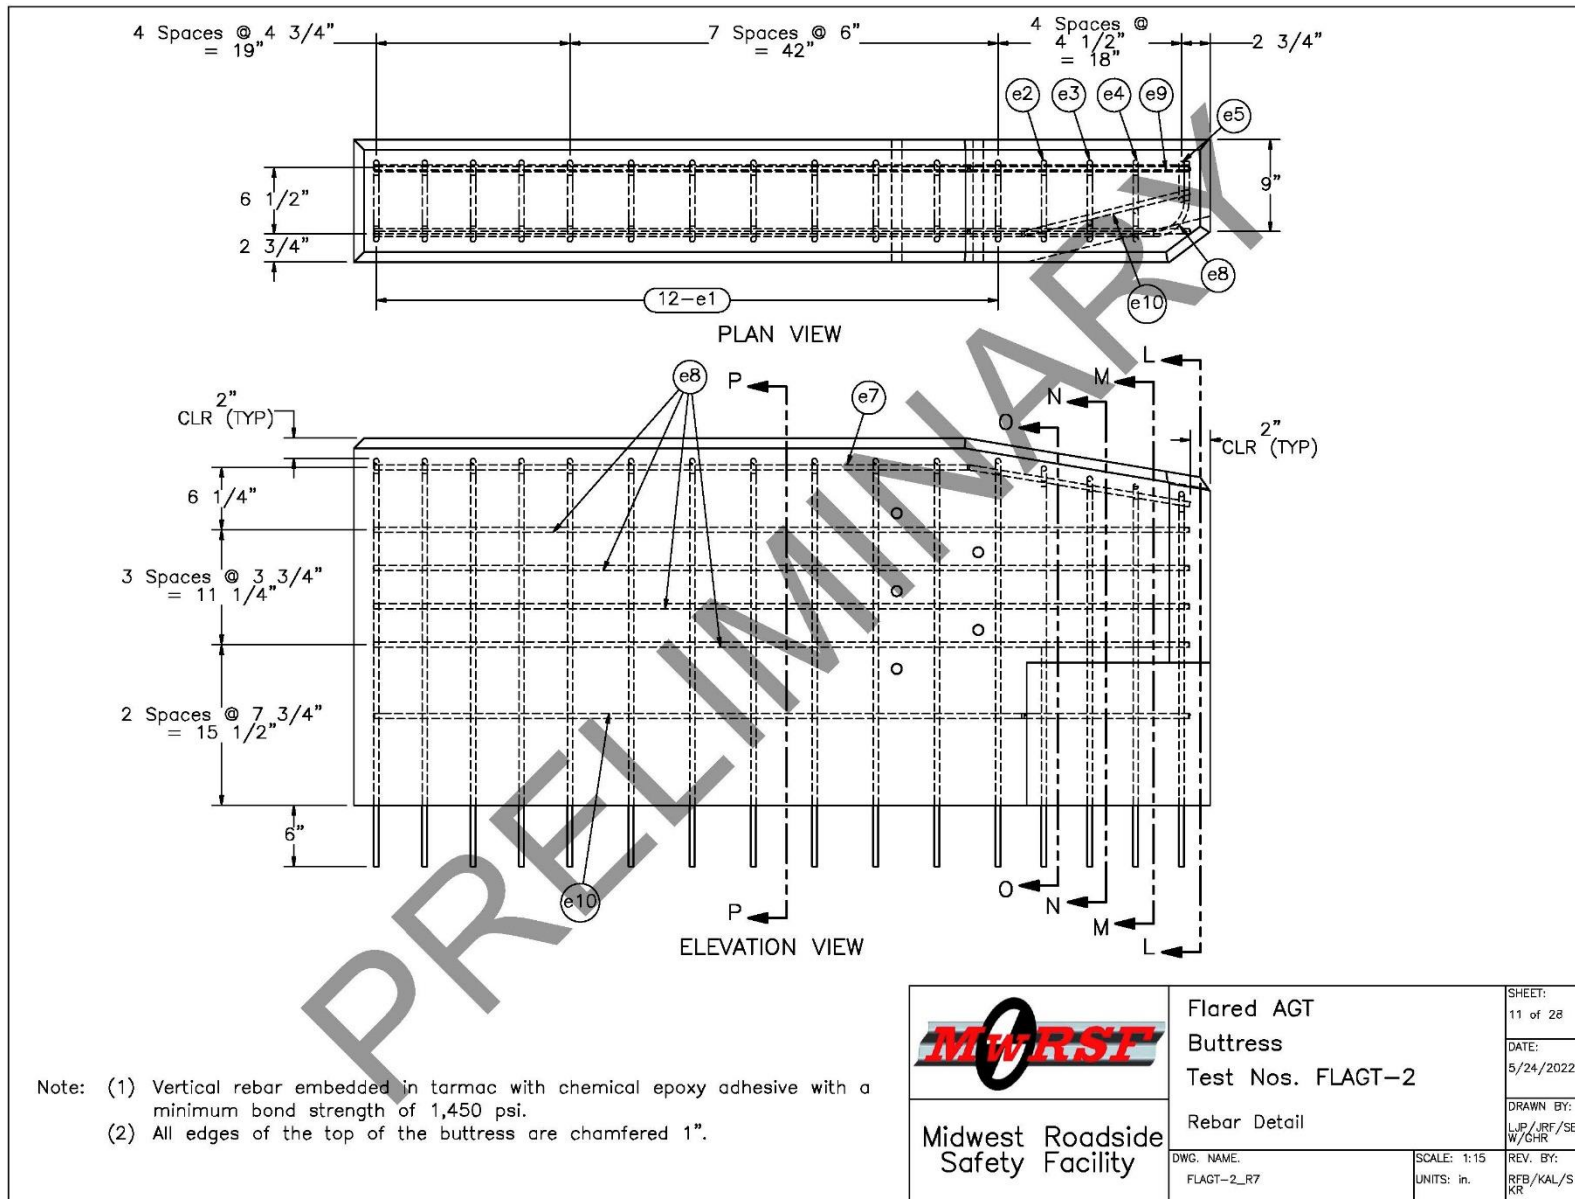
Buttress Rebar Detail, Test No. FLAGT-2
